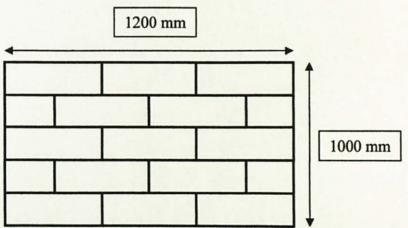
Front view of the prototype crumb rubber noise barrier wall without crumb rubber filler and side wall
